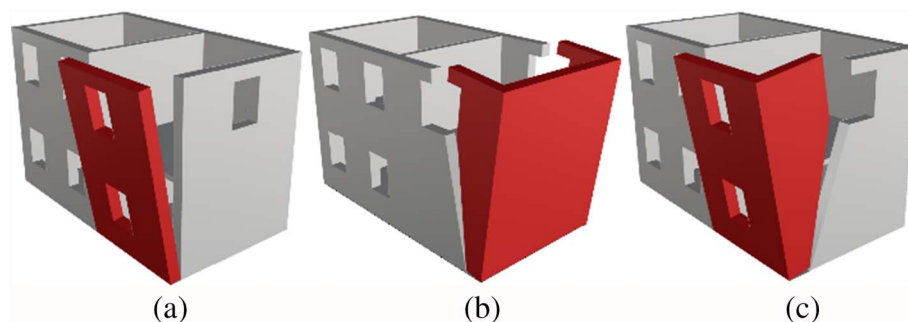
Three examples of out-of-plane mechanisms of a masonry building's wall.
